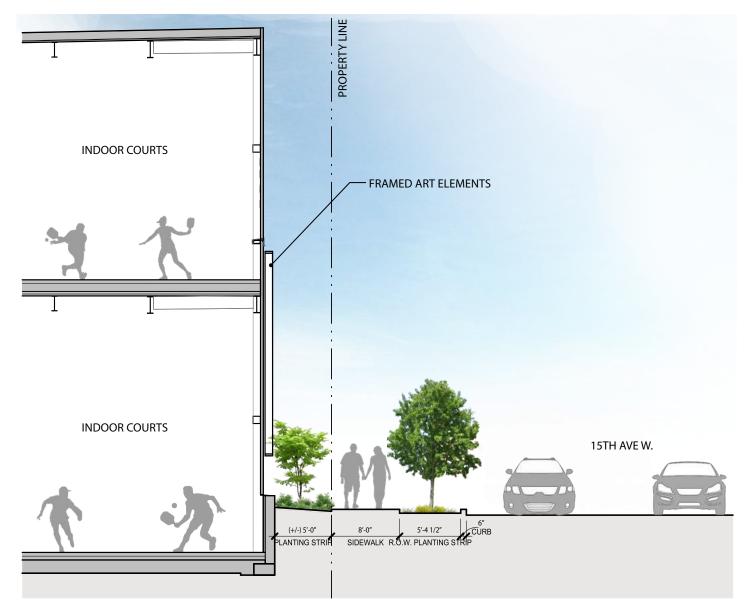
TYPICAL STREET SECTION ALONG 15TH AVE. W.
